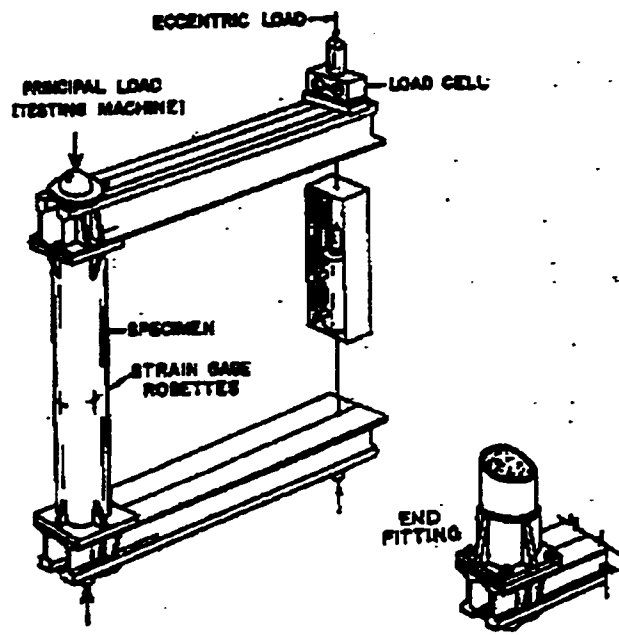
Arrangement of specimen and testing apparatus [Furlong (1967)].
